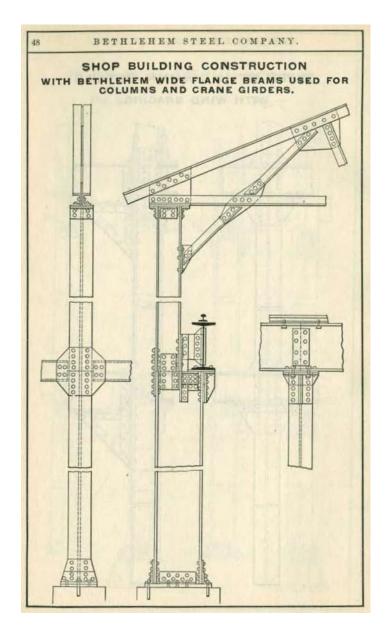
Construction Example Similar Detail to Building 6 Structural Steel Shapes, Bethlehem Steel Company 1st Edition, 1907
